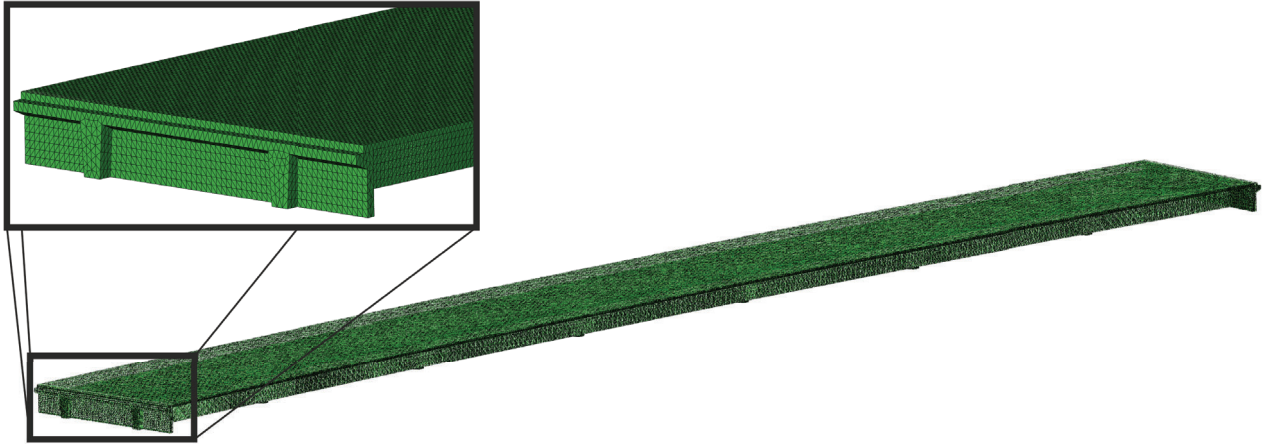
FE MODEL OF ONE SUPERSTRUCTURE OF THE BRIDGE STADER STRASSE, HAMBURG, GERMANY. CALCULATIONS ARE PERFORMED USING ABAQUS®
